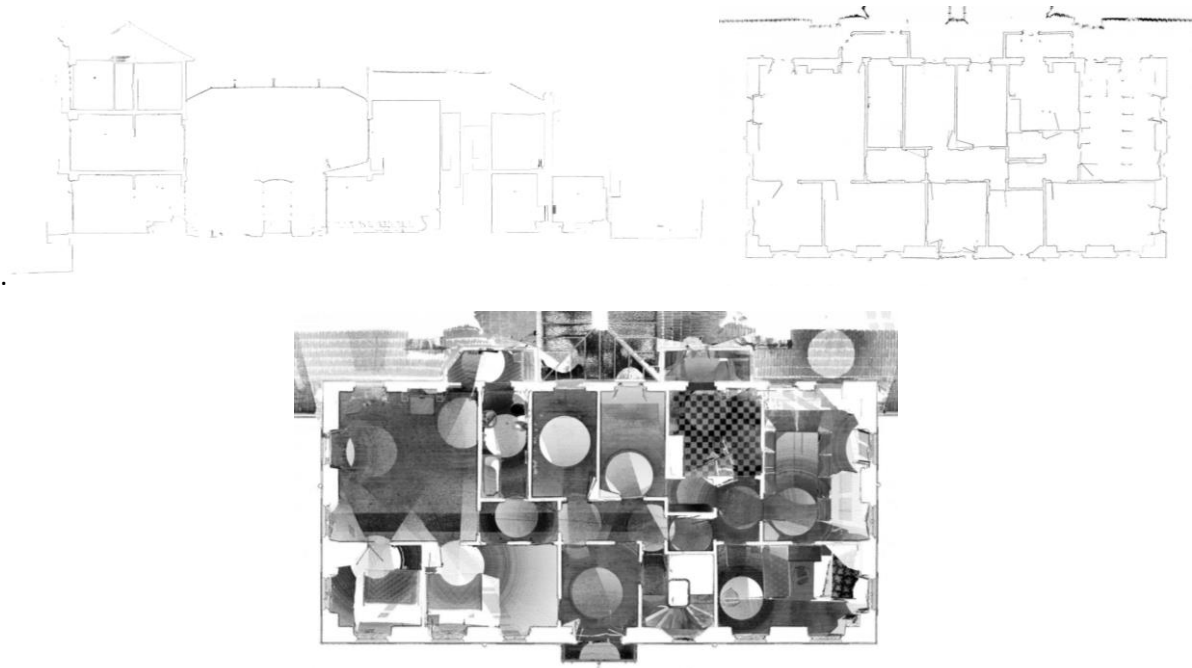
Top images: vertical and horizontal sections; bottom image: floorplan ortho-images. Source: image courtesy ArchC_3D
